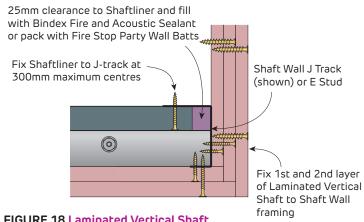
Laminated Vertical Shaft Corner Transition to Shaft Wall Plan view
